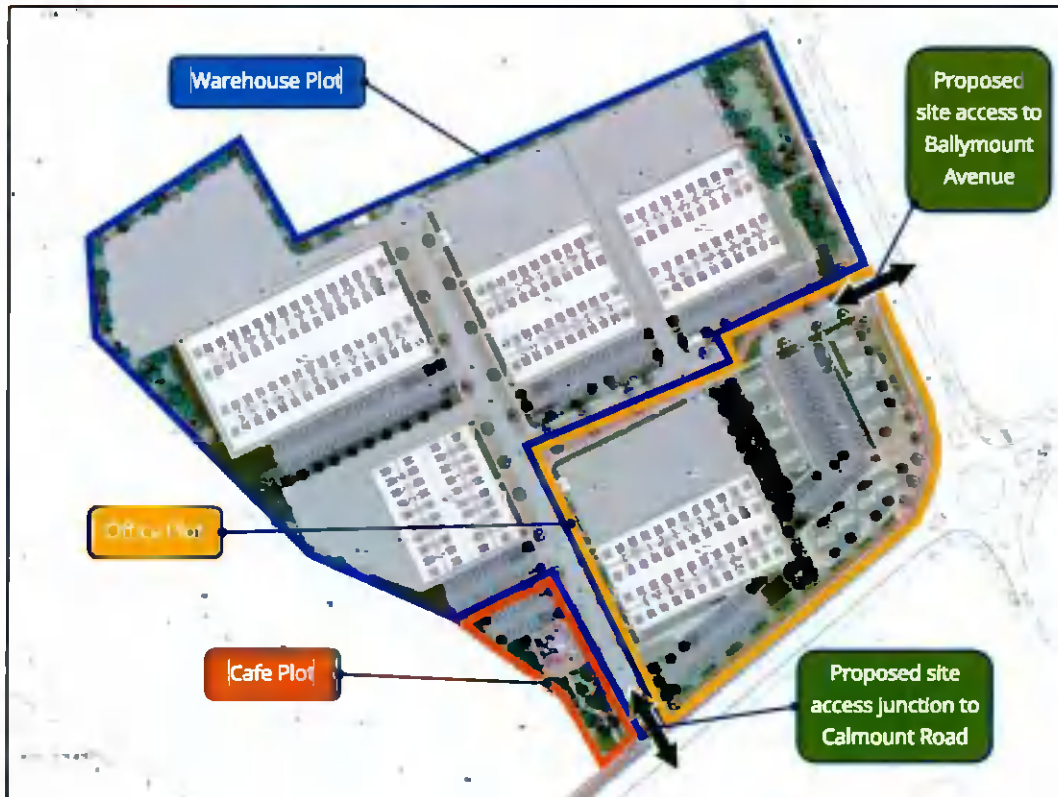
Proposed Site Layout with Proposed and Future Vehicle Access Points
